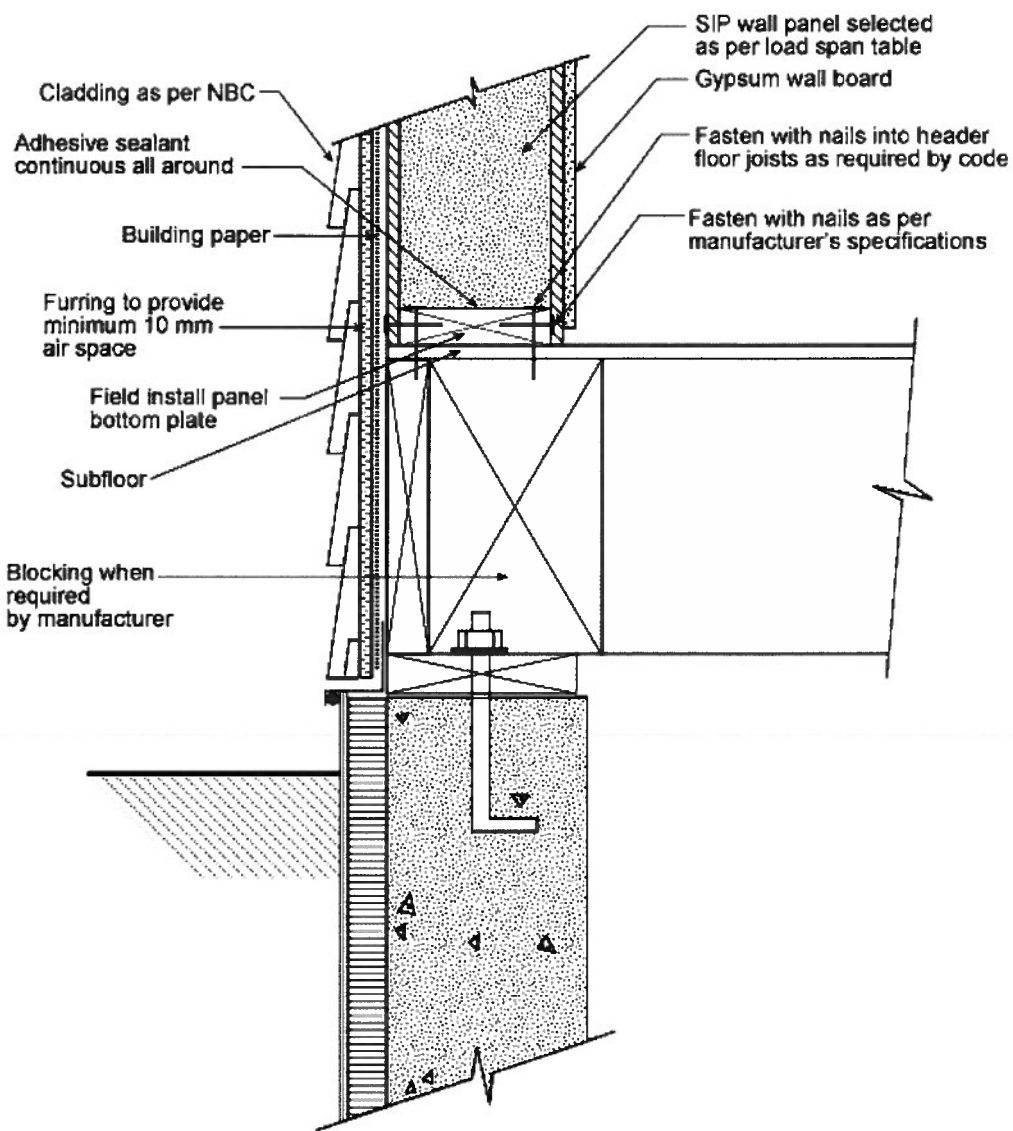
"Insulspan SIP System" – details of a wall panel connection to floors and rainscreen cladding. See manufacturer's details for sealant and tape requirements
